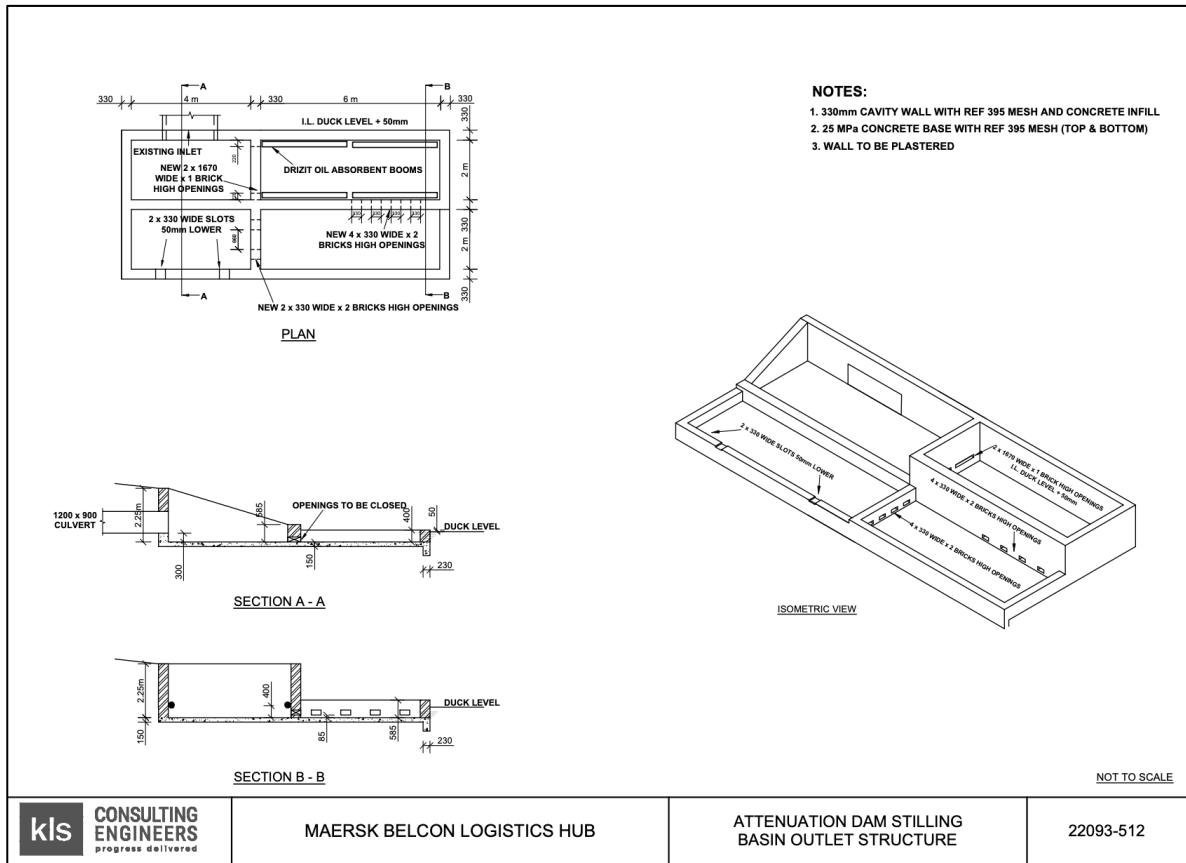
ATTENUATION POND STILLING BASIN OUTLET STRUCTURE
